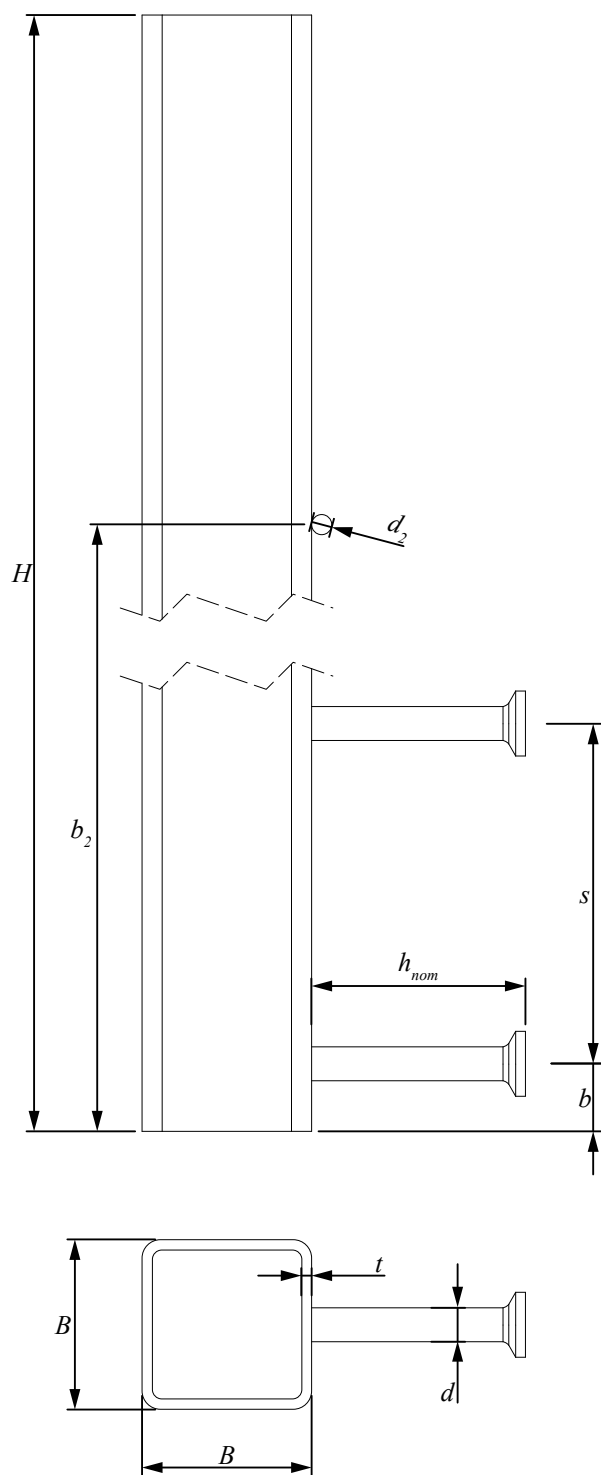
KAPU®-403...KAPU®-803 dimensions.
